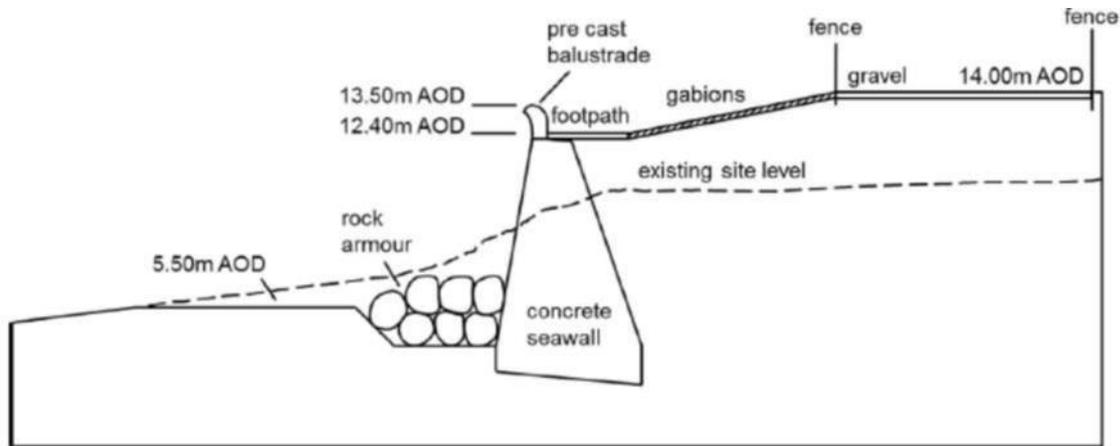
Section through the proposed seawall at Hinkley C power station.
